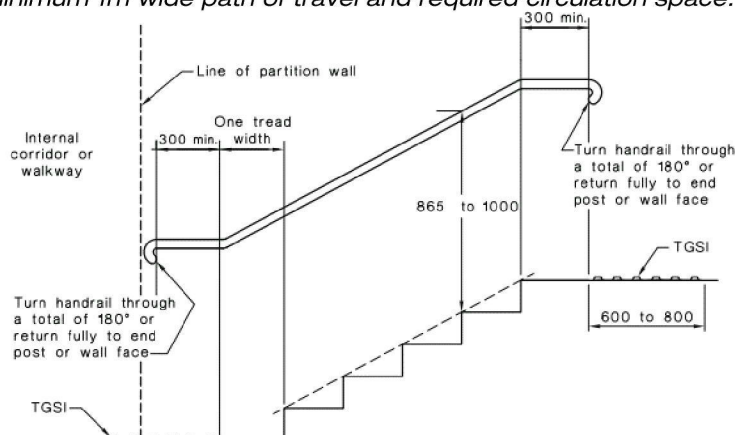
Handrail Details – Clause 10.3 and 12 of AS1428.1-2009
